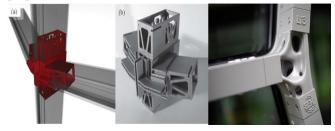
a full-size aluminum prototype node of a Nematox façade node (a, b) [24] (c) Li3designers façade connection [25].
